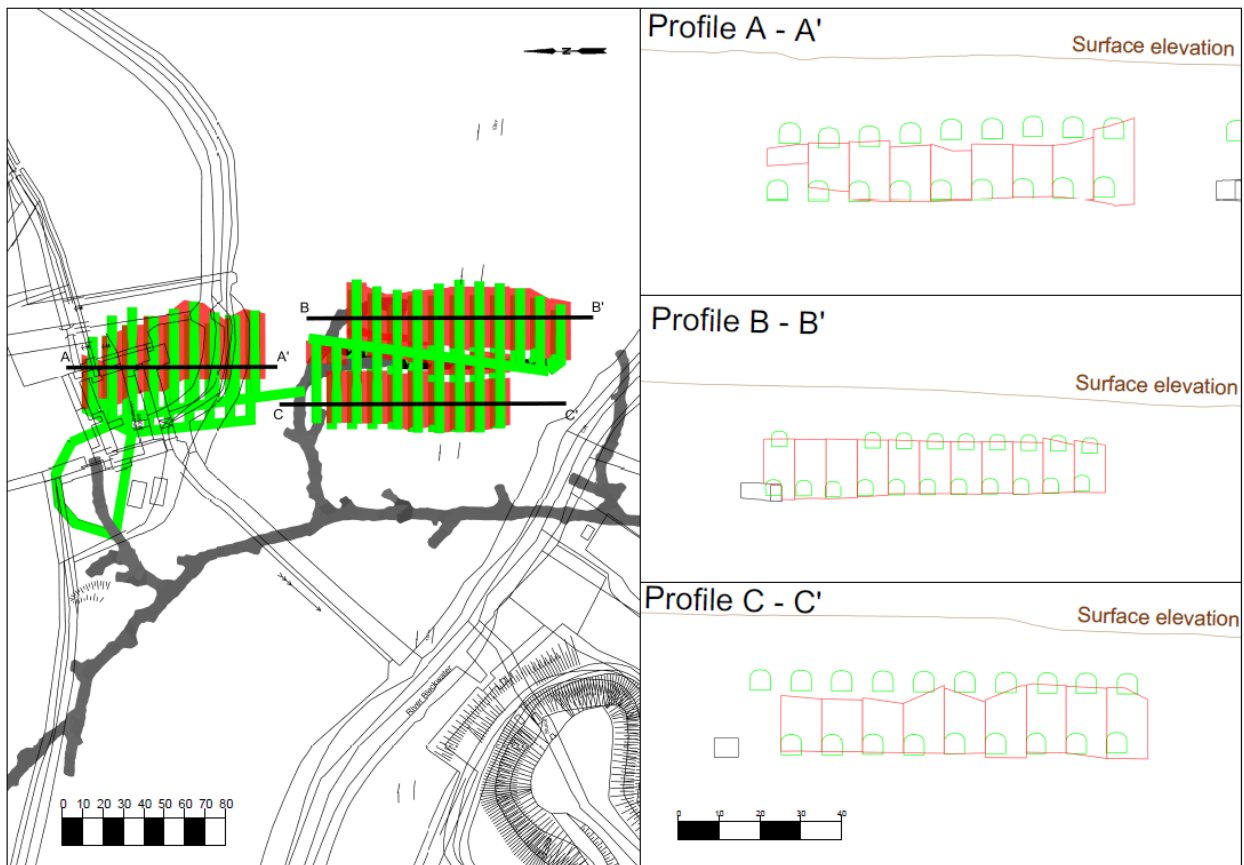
CROWN PILLAR VERTICAL SECTIONS
